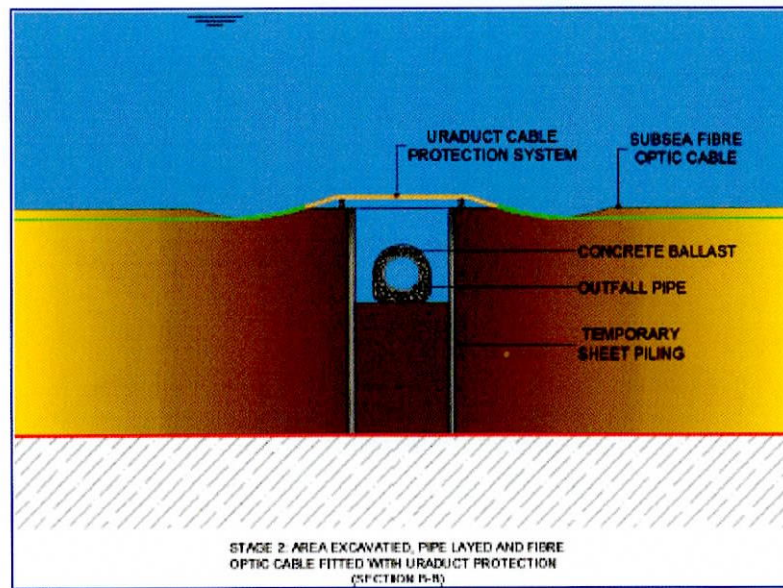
Fibre Optic Cable Crossing – Stage 2 – Install Outfall Section
